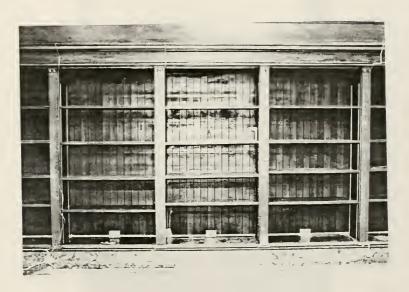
Room 202. Doorways and glassed-in shelving in north wall.
